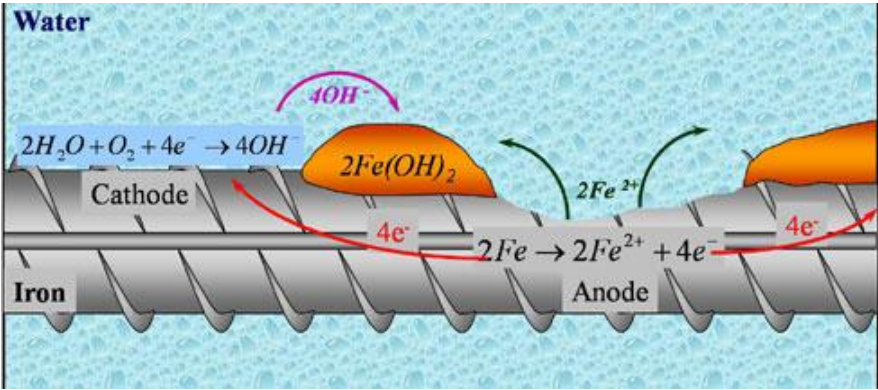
Corrosion process on reinforced concrete steel bar (URL-1).
